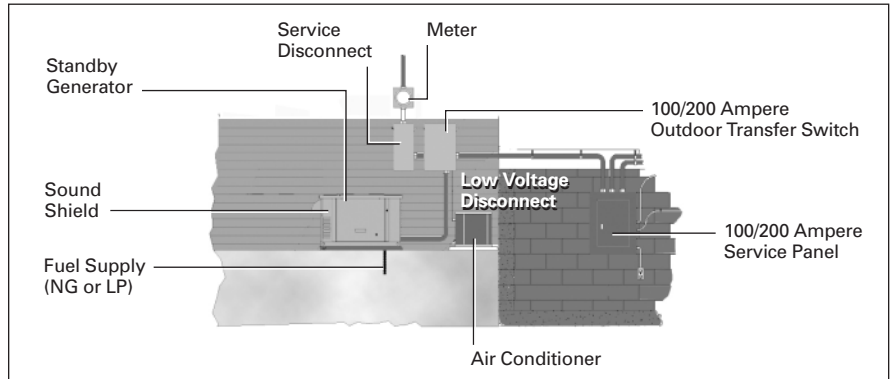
100/200 Ampere — Outdoor Installation — Whole House Pre-Wired
